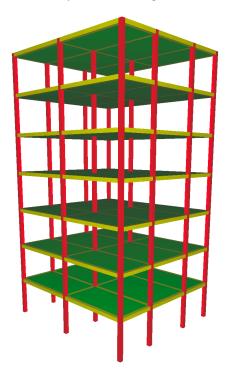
frame = STRUCT(pillars, trusses, trusses1, floorslab);
